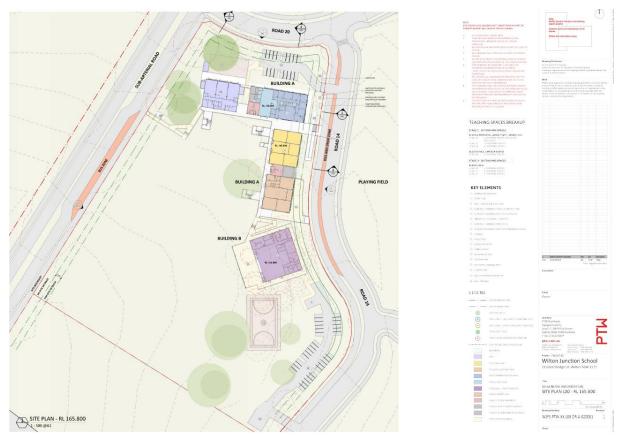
Proposed Site Plan – Staging. Source: PTW, 2025
